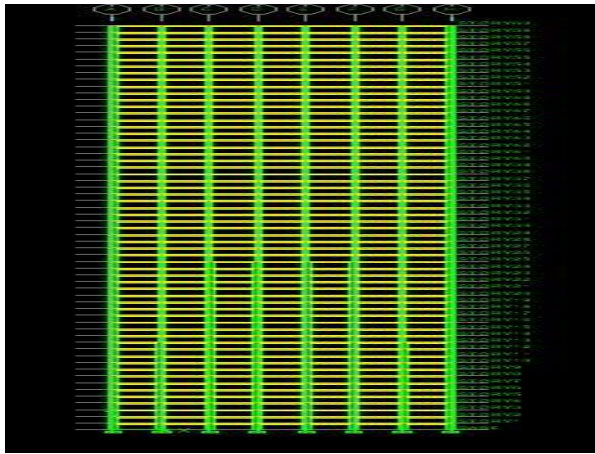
Elevation of bare frame of hard soil for zone V at section 1-1
